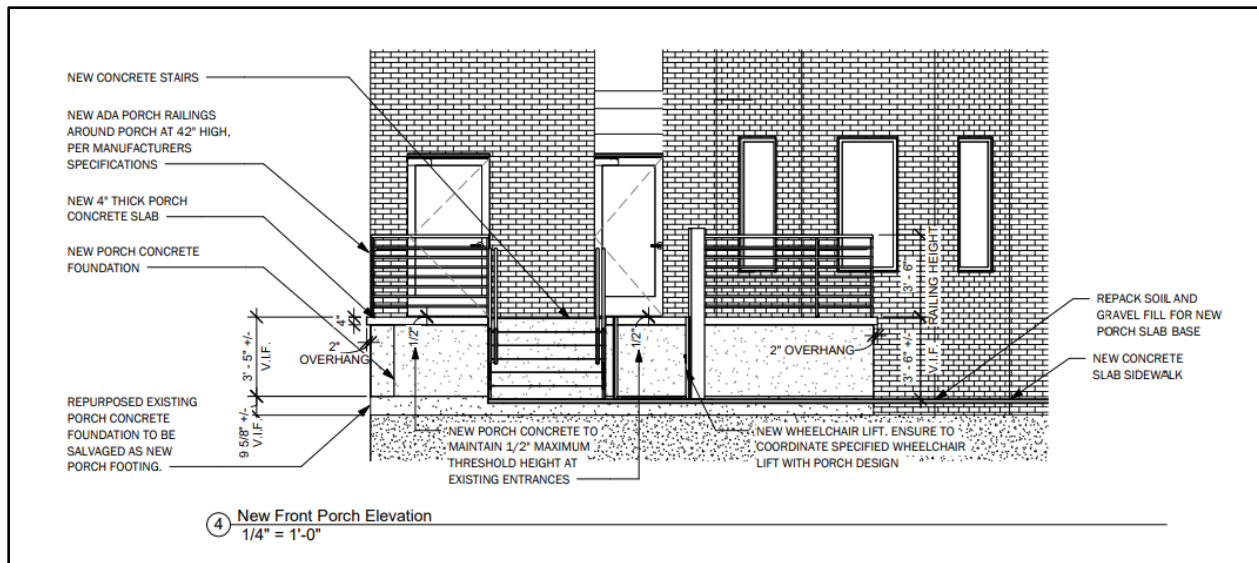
Elevation of Proposed Front Porch, Originally Submitted by Applicant
